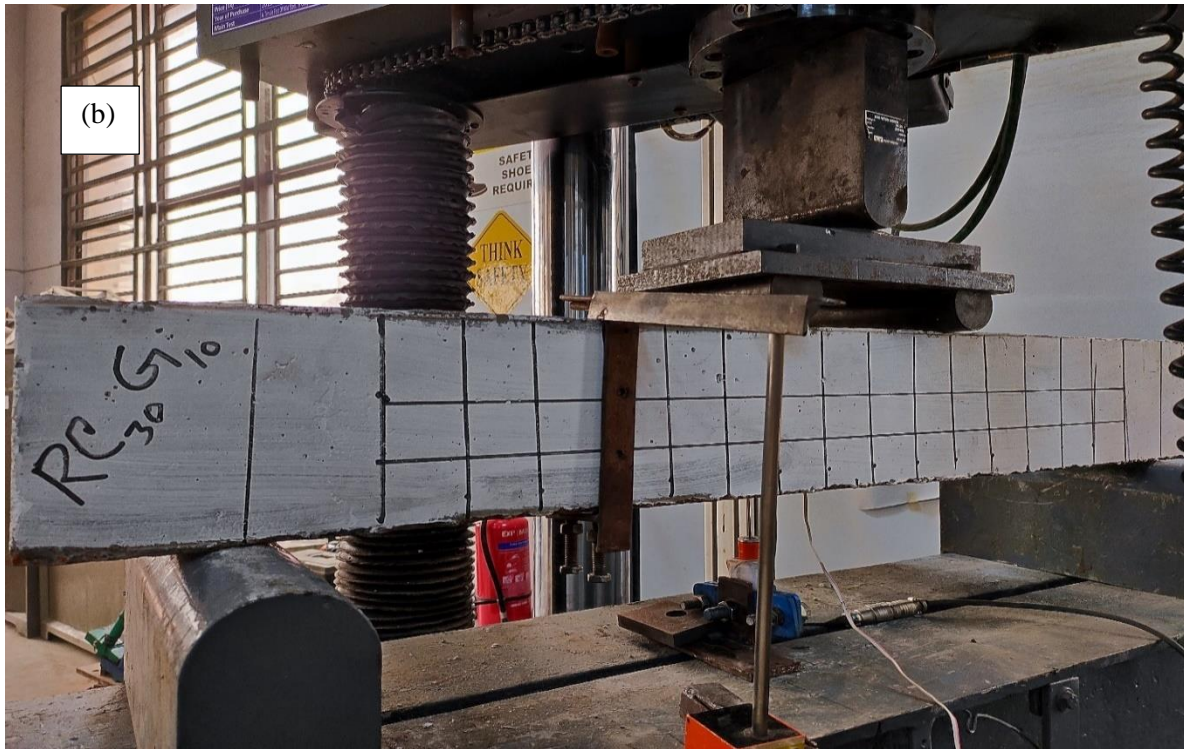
(a,b) Four-point bending test setup of reinforced concrete (RC) beam
